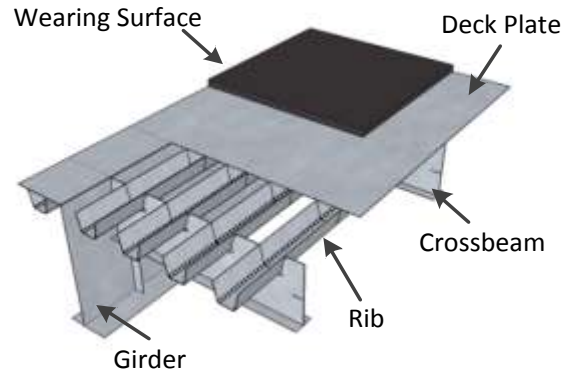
Components of the Orthotropic Steel Deck Bridge Girder System
